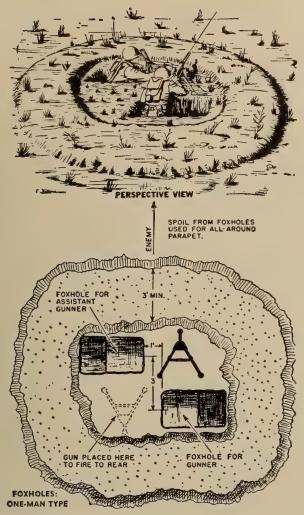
Two-foxhole type emplacement for the machine gun, M1919A4.
